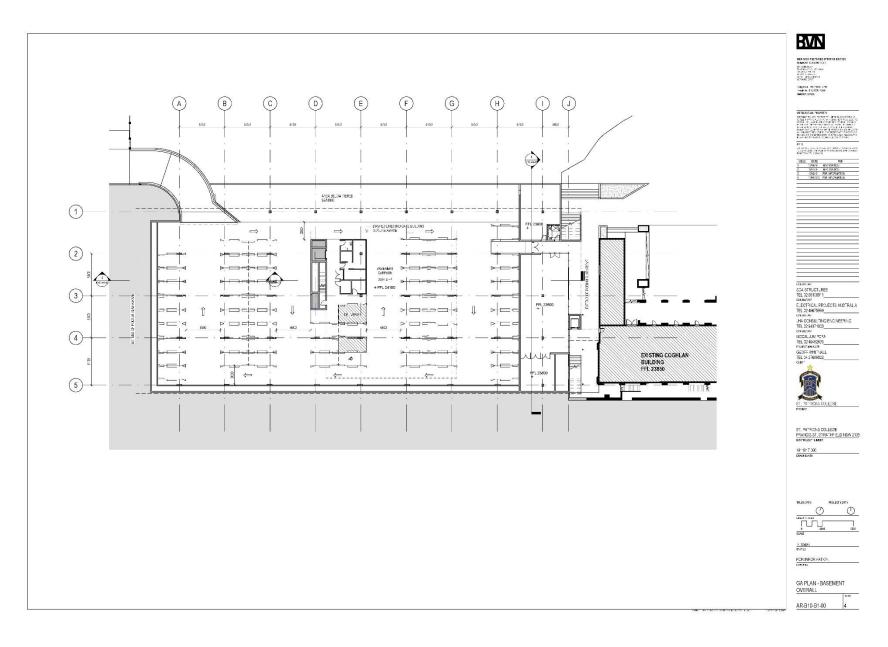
Proposed STEMM building – General Arrangement Plan – Basement Level. Source: BVN 12/2/2020, AR-B10-B1-00 Issue 4
